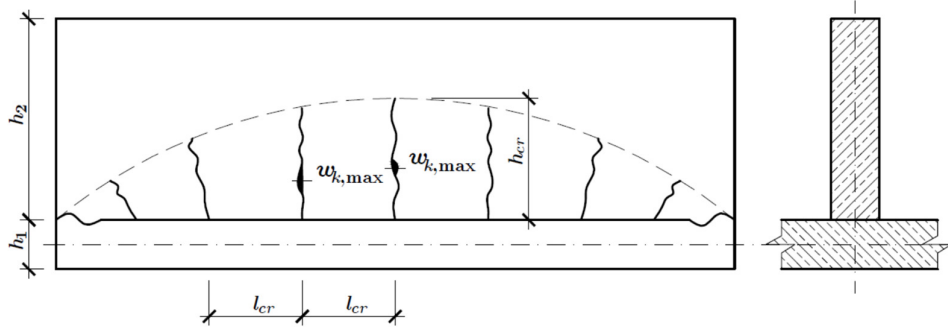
Cracking pattern in an externally-restrained reinforced concrete element [Flaga, Furtak, 2009]
